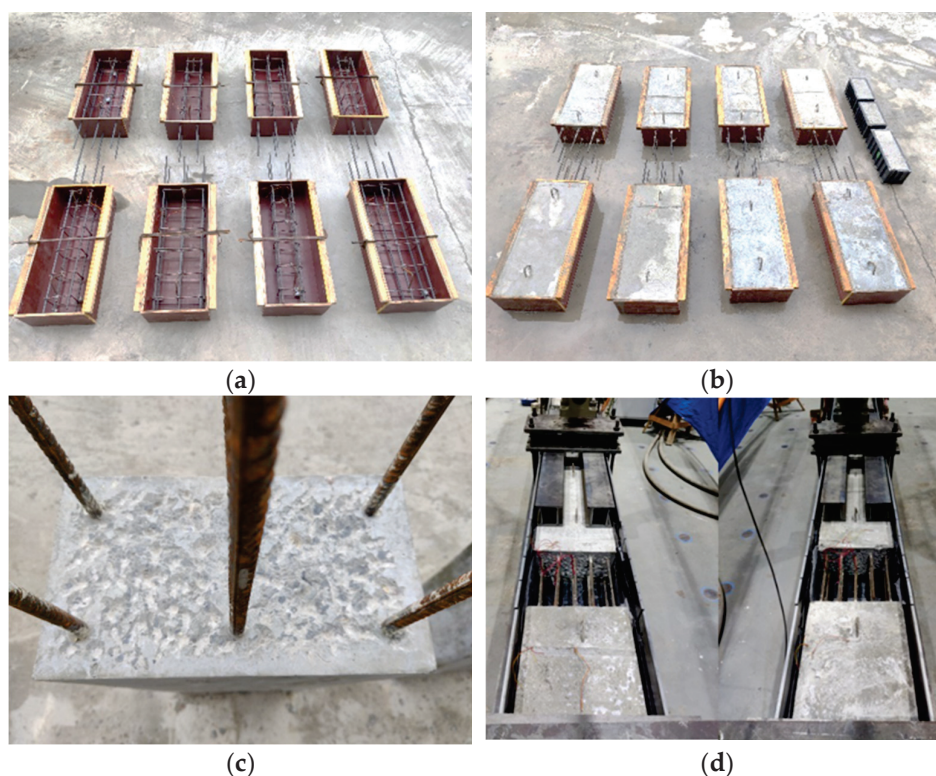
Fabrication process of the test specimens. (a) Manufacturing formwork and rebar. (b) Casting of Precast section concrete. (c) Roughing the interface. (d) Assembly of the steel framework.
